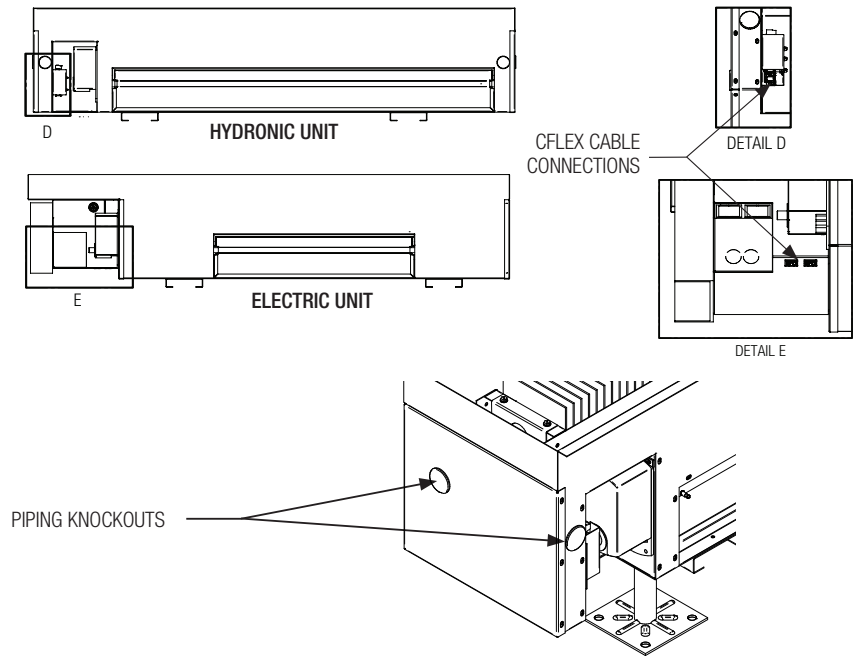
LNT FLOOR TILE SUPPORTED PLENUM SIDE VIEW ▼
